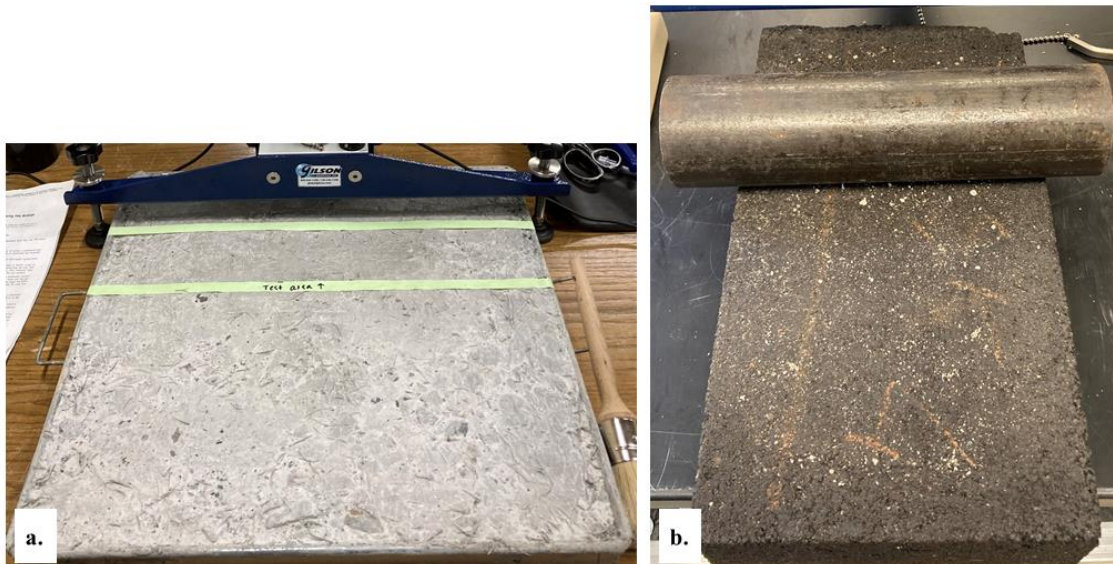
(a) Concrete and (b) asphalt surfaces used for testing material supplemental friction. The concrete test surface used was fiber-reinforced concrete pavement and had a background friction of 70.3 ± 0.687 BPN throughout testing. The asphalt test surface used was hot mix asphalt and had a background friction of 80.6 ± 0.540 BPN throughout testing. Skid resistance tests were performed with a British
